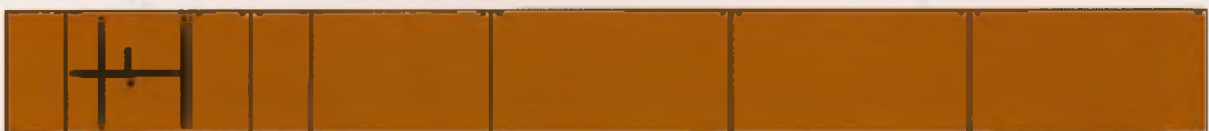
Tunnel ceiling sections, the test section contains cross pattern
